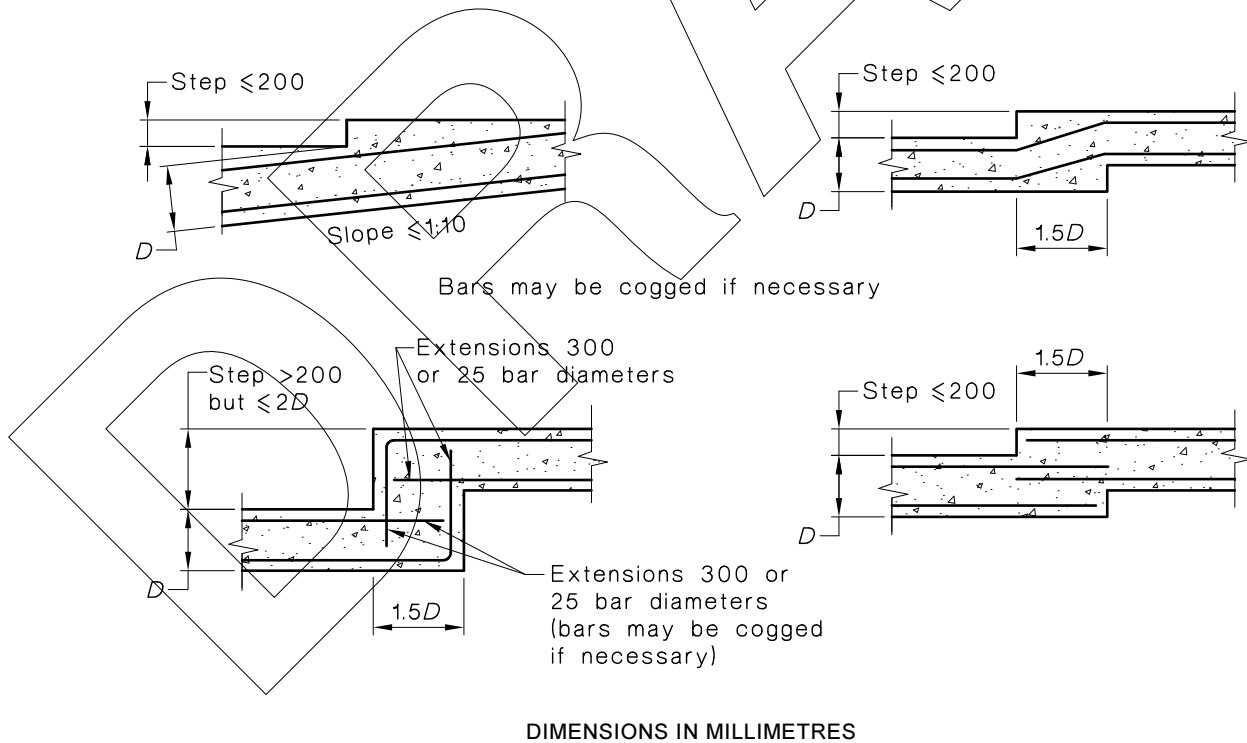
ACCEPTABLE METHODS OF STEPPING STRIP FOOTINGS
